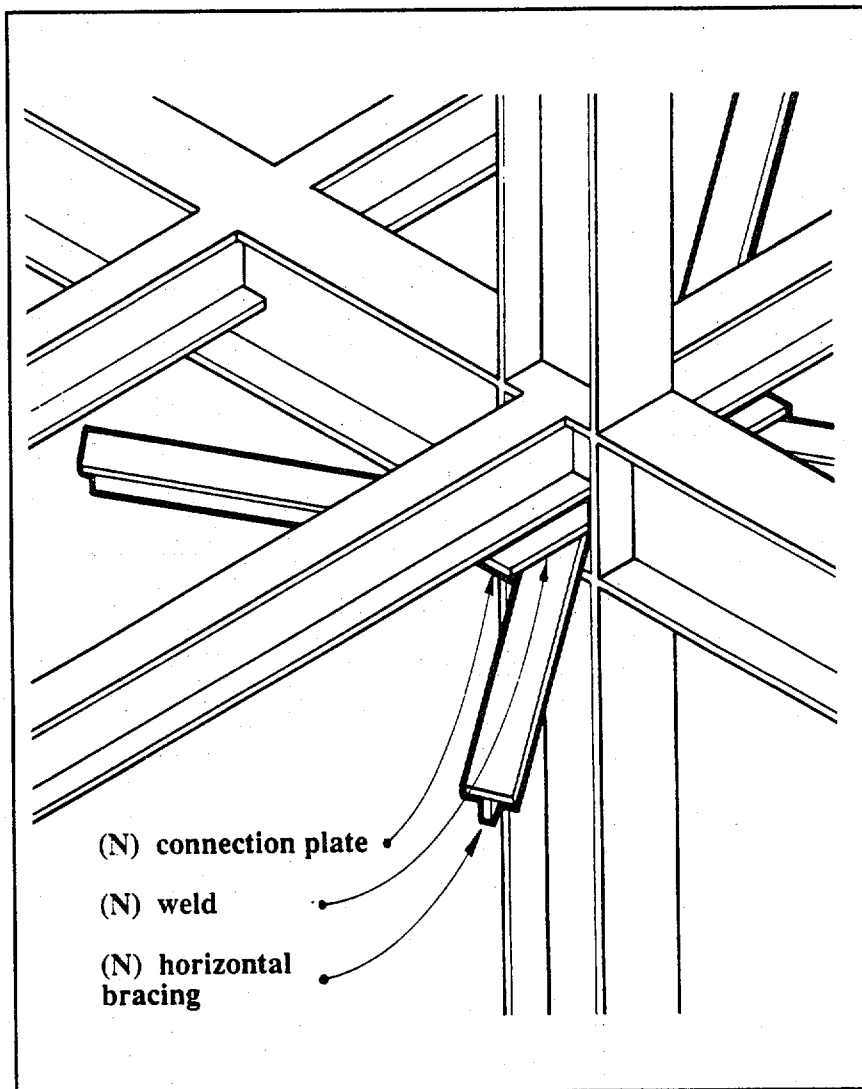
Strengthening an existing steel deck diaphragm.
